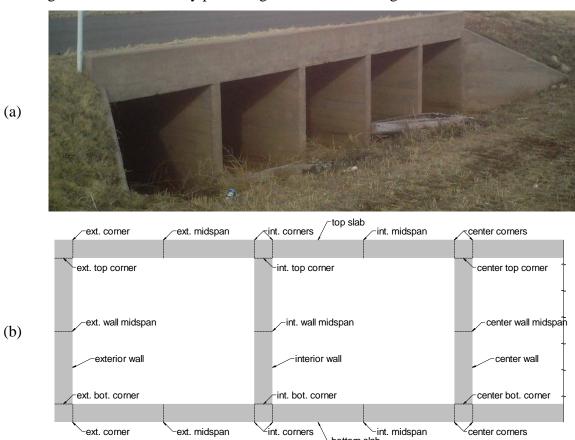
(a) A five-span reinforced concrete box culvert in Swisher Co., TX; (b) potential critical section schematic
